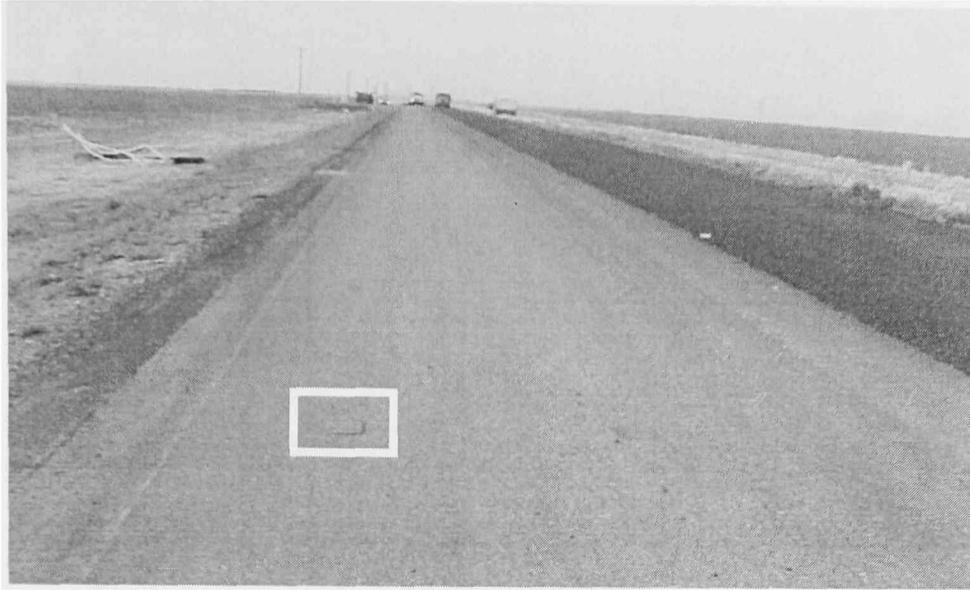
Collection of Field Specimen at Test Projects (Insert Shows Specimen Plates Placed on Existing Pavement)
